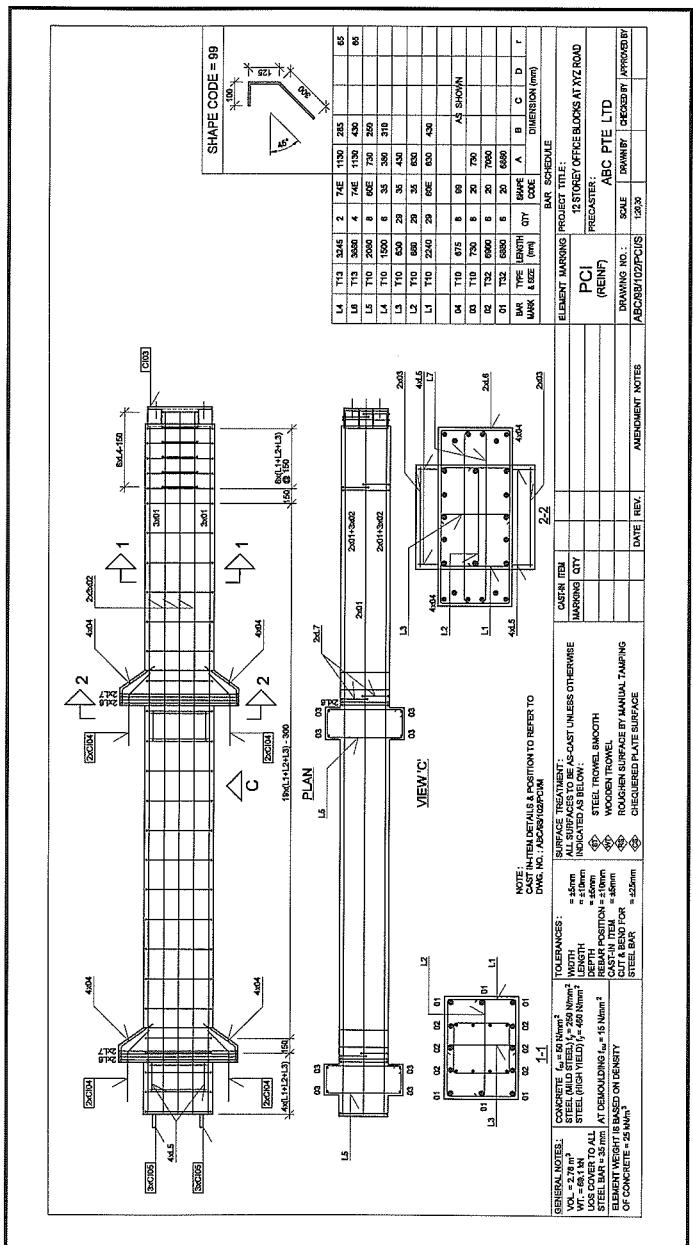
Mould Details Of Precast Column (12-Storey Office Block)
